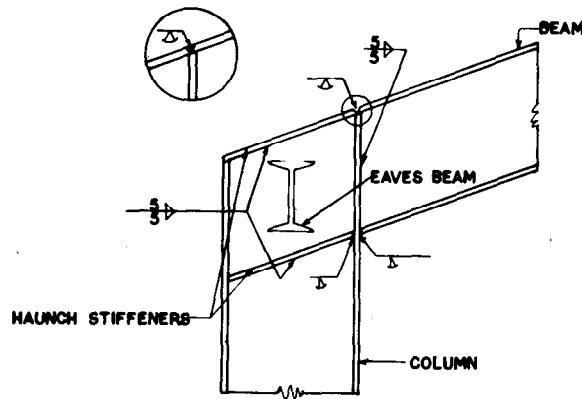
EXTERIOR COLUMN AND RAFTER CONNECTION DETAIL
